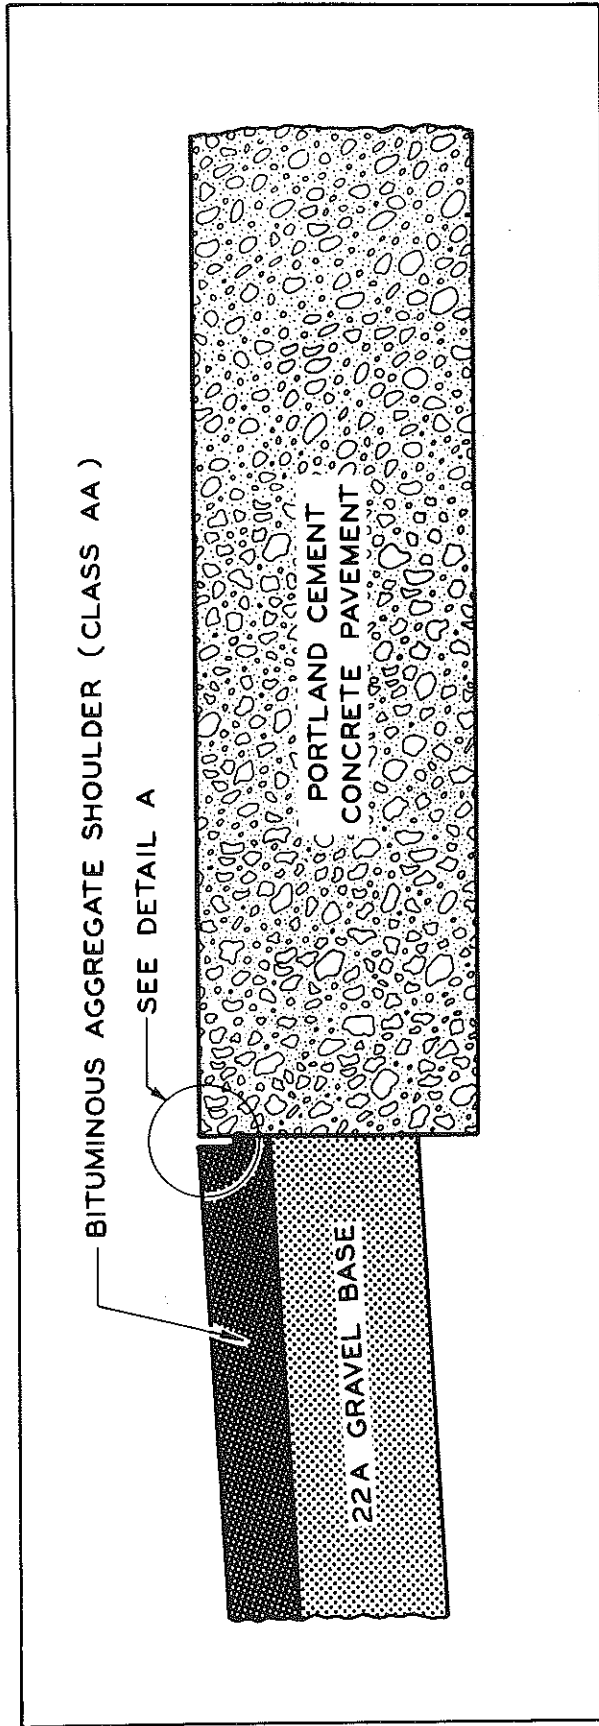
Seal-treated joint between bituminous aggregate shoulder and portland cement concrete pavement.
